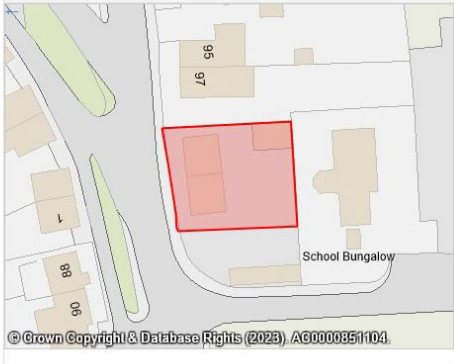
Site Location Plan (Drawing Ref: A-01)
